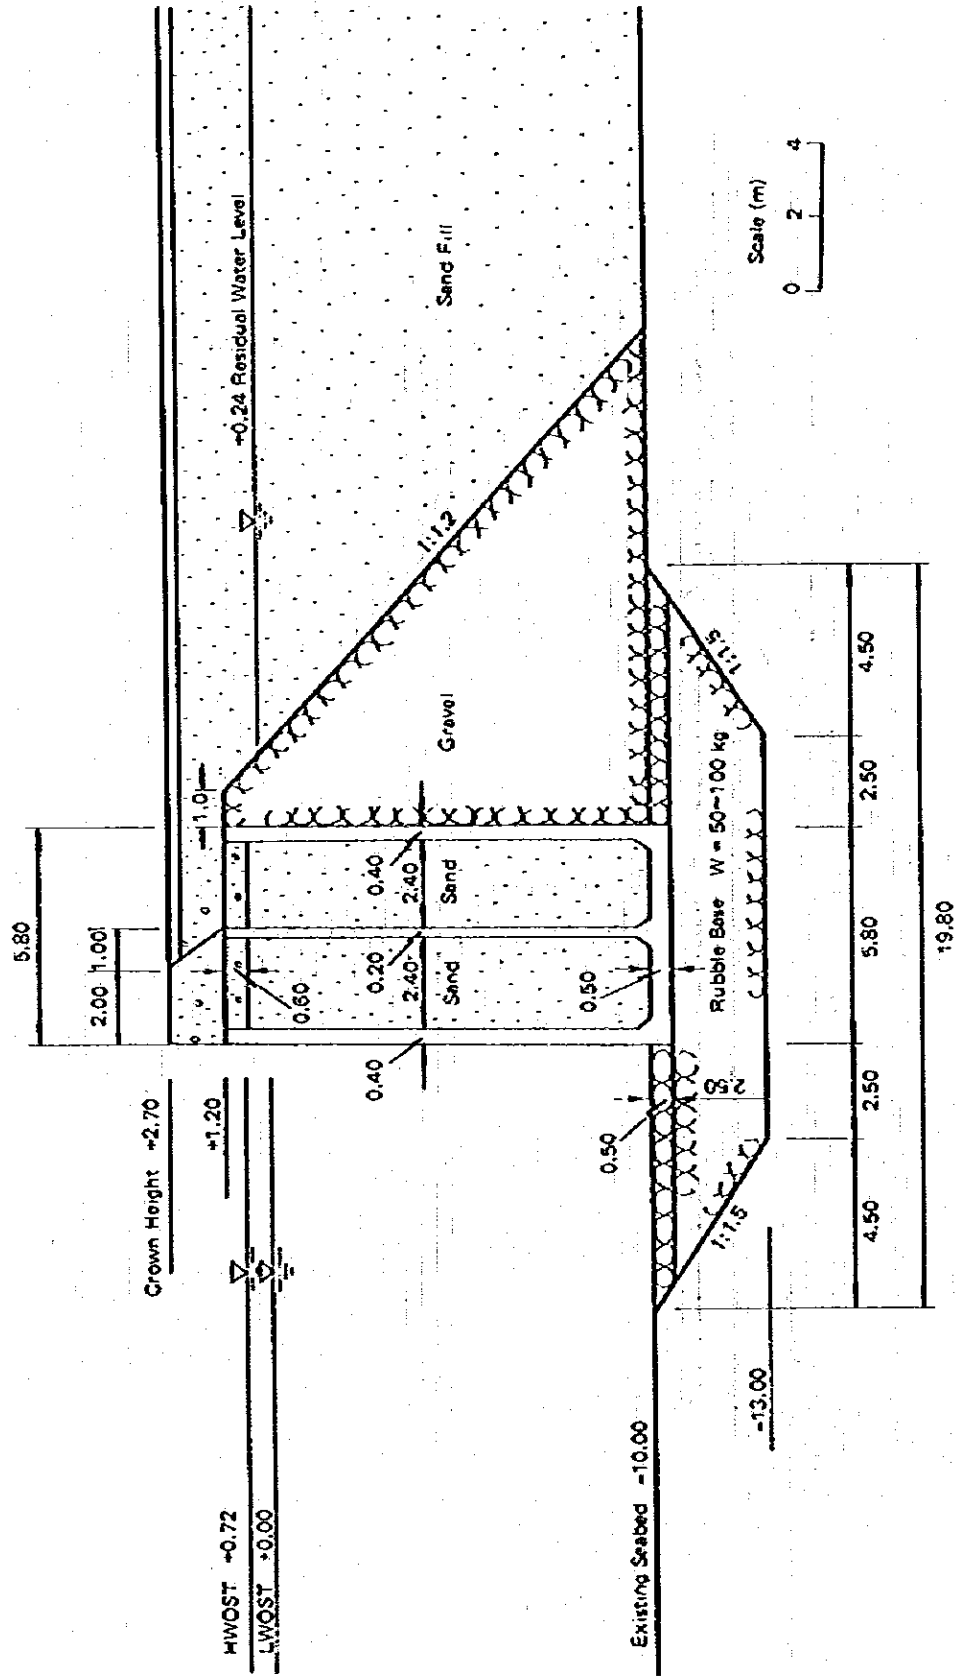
(b) Plane of Gravity-Type Caisson Bulkhead (-10m)
